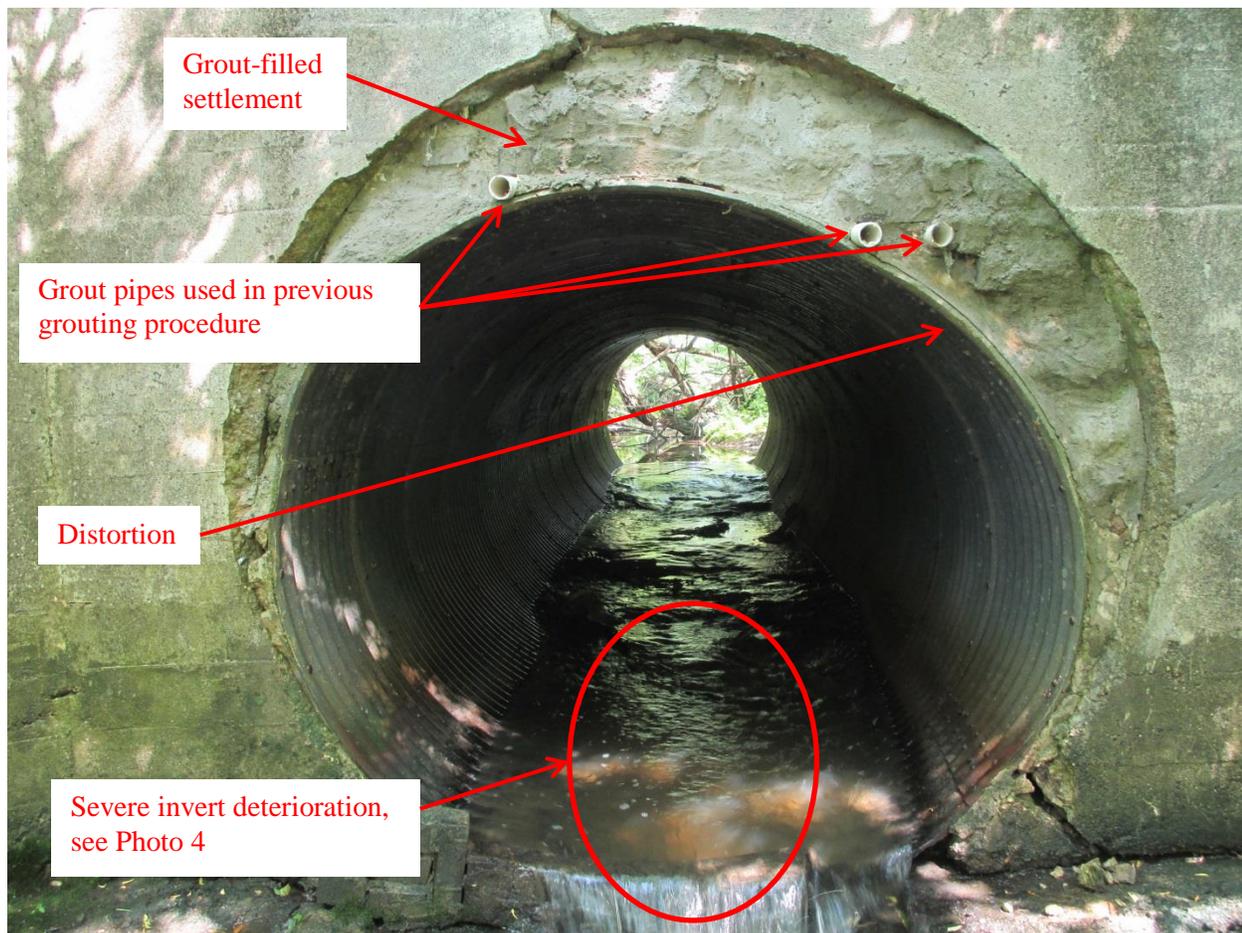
Looking west at the east end elevation on the downstream end (i.e. outlet) of culvert.
